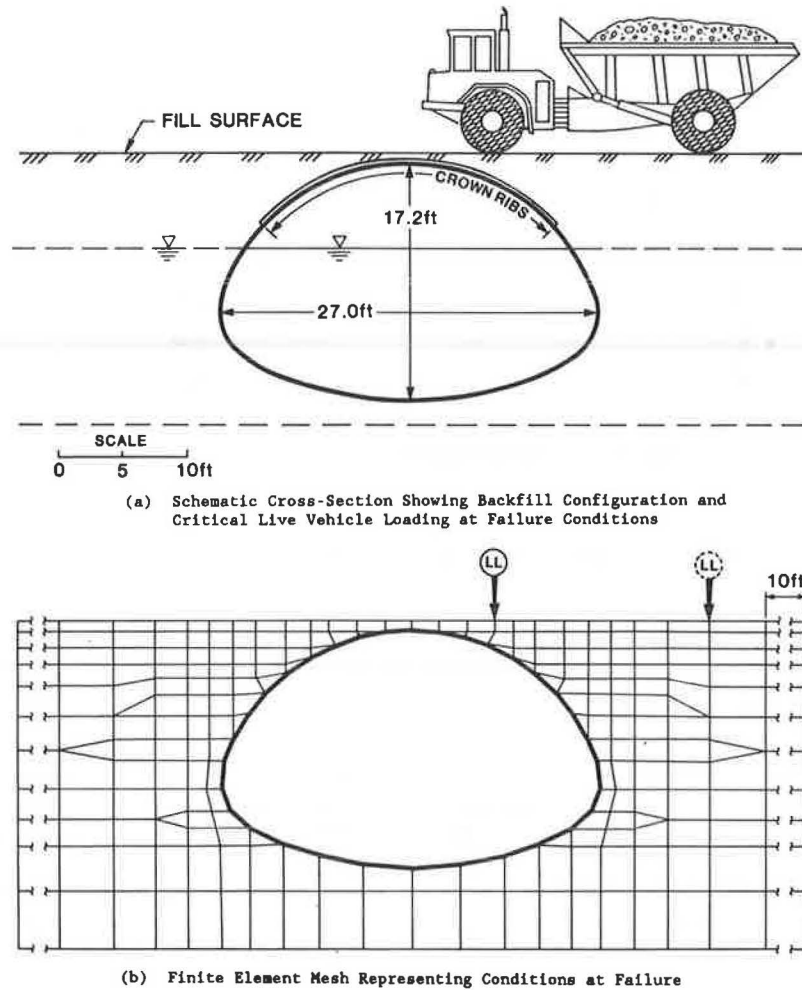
Twenty-seven-ft span pipe-arch culvert structure near Cooper City, Florida (a) Schematic cross-section showing backfill configuration and critical live vehicle loading at failure conditions, (b) Finite element mesh representing conditions at failure.
